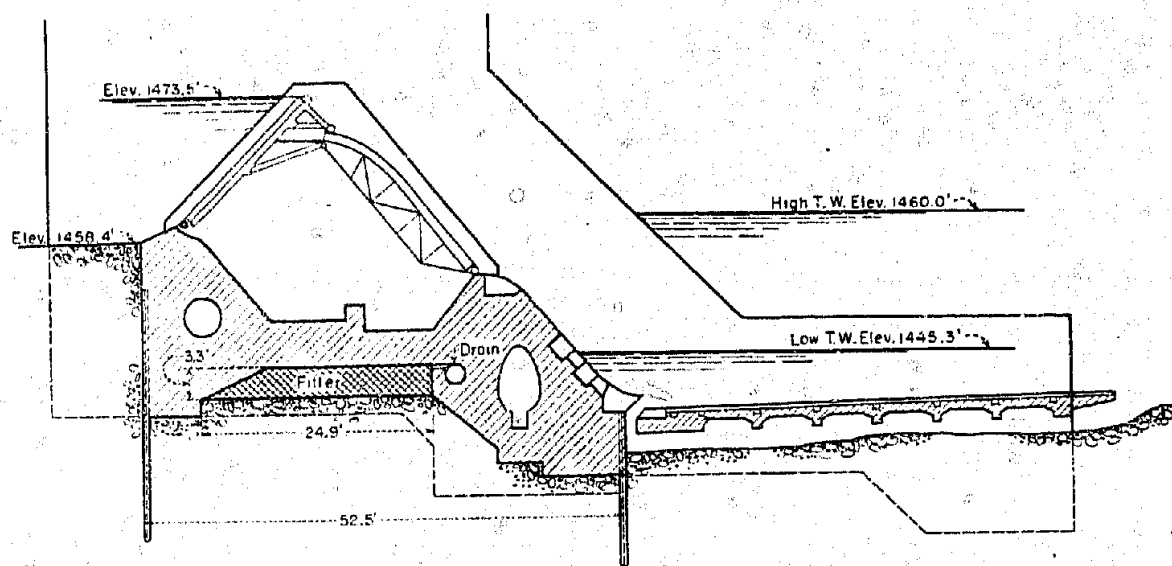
THE BEAR TRAP DAM AT HALLEIN, AUSTRIA, WITH A SHELF-APRON SUPPORTED BY REINFORCED CONCRETE (FROM A. SCHOKLITSCH, "DER GRUNDBAU", J. SPRINGER, BERLIN, 1932).
